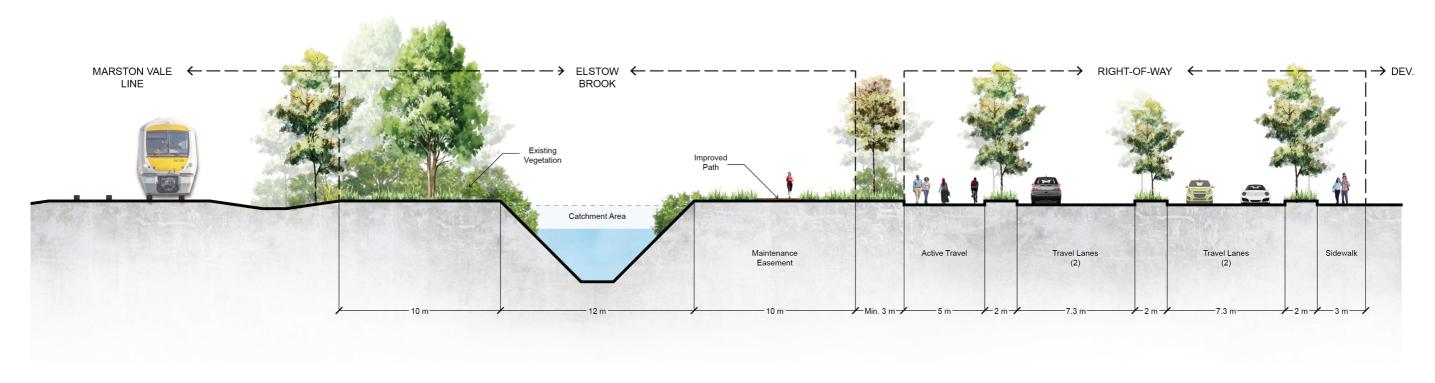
Indicative cross section through Marston Vale Line, Elstow Brook and public right of way (not to scale)
